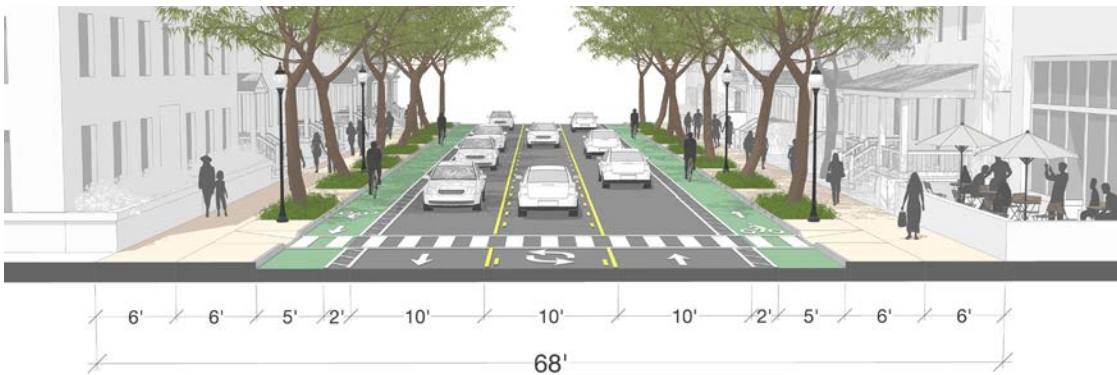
East Harding Avenue from Main Street to Texas Street and Indiana Street to Ohio Street
